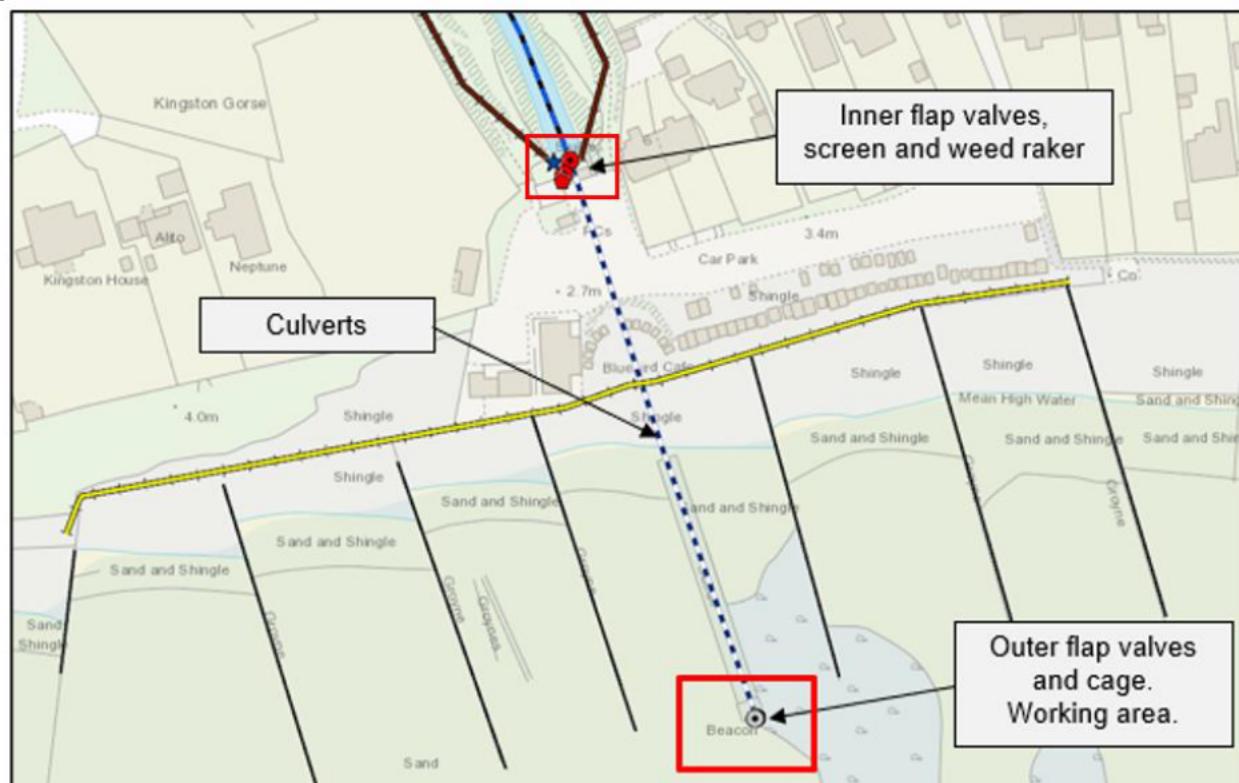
Ferring Rife outfall plan view. Site boundary in red boxes.
